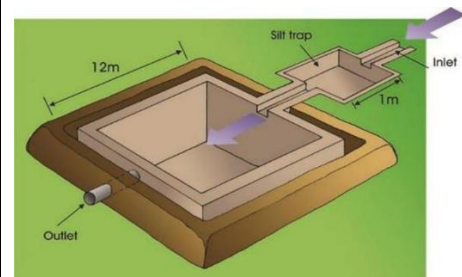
Surface water-harvesting pond showing inlet channel, silt trap, spillway and outlet arrangement in plan view.
